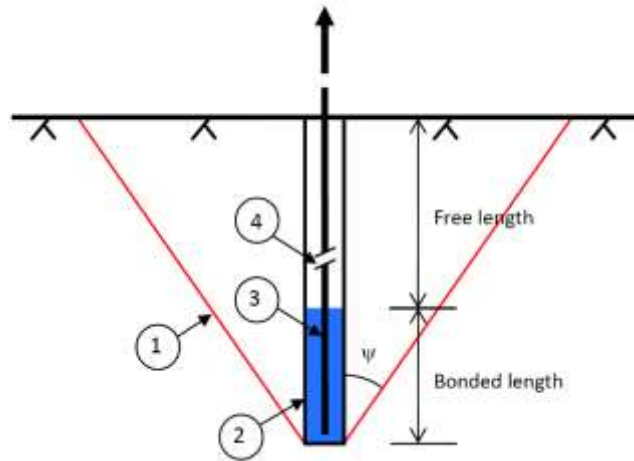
Four principal failure modes of a rock anchor from literature: (1) rock mass uplift failure; (2) grout-rock bond or interface failure; (3) tendon-grout bond or interface failure; and (4) steel tendon tensile failure.
